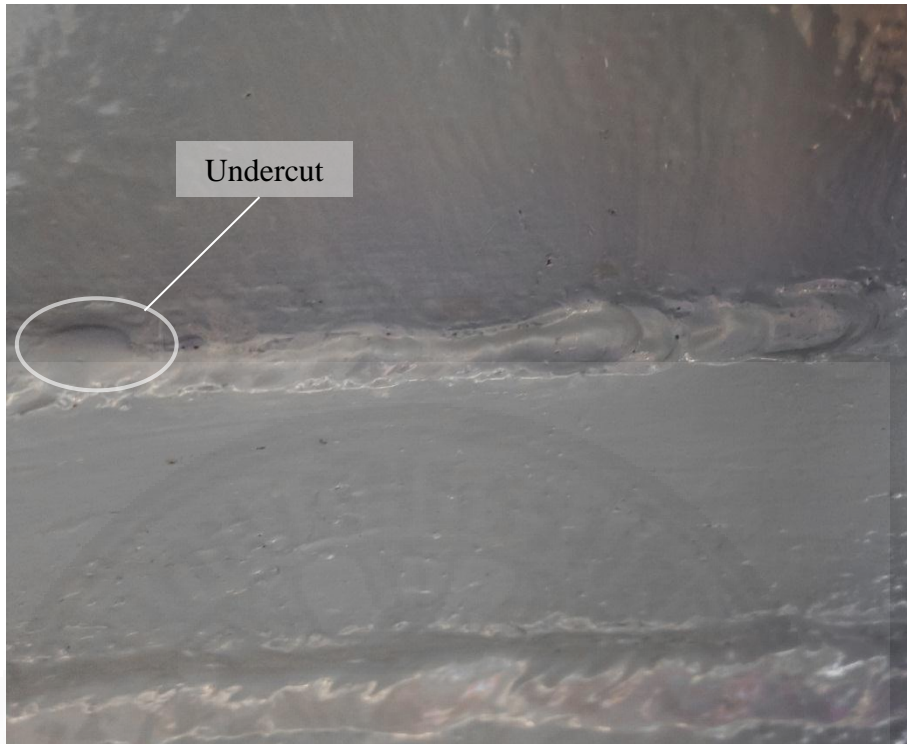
Welding defects on Steel Structure A (joint 1)
